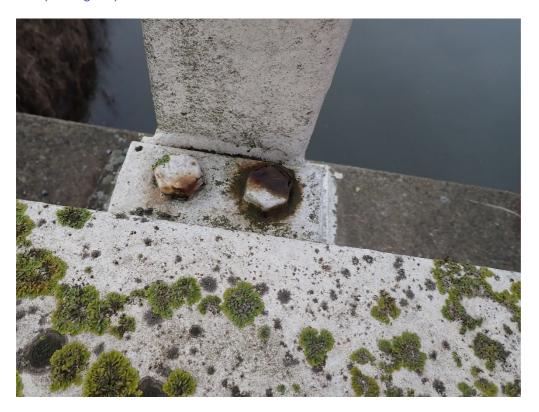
Typical Corrosion to Fixings Where Paint Has Failed
